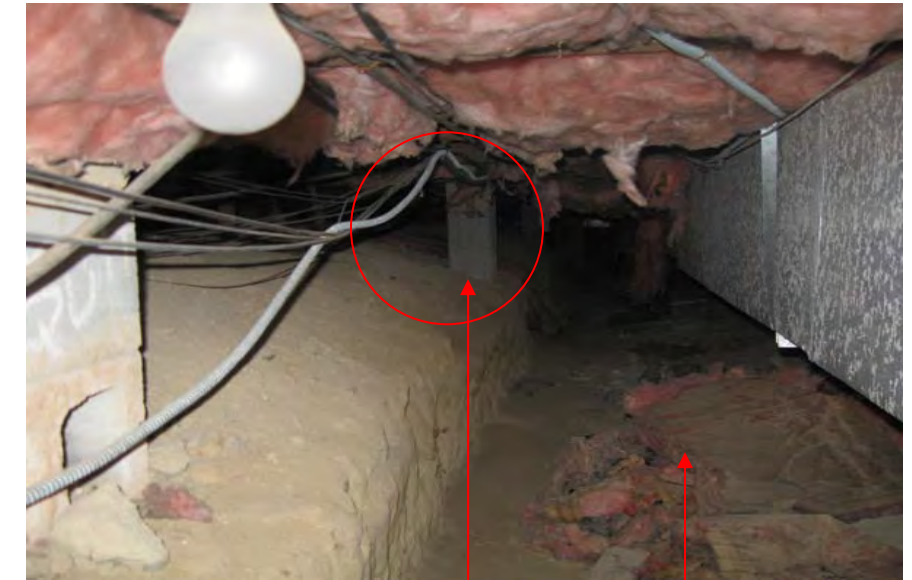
Masonry pier for balcony post support Mechanical Trench
